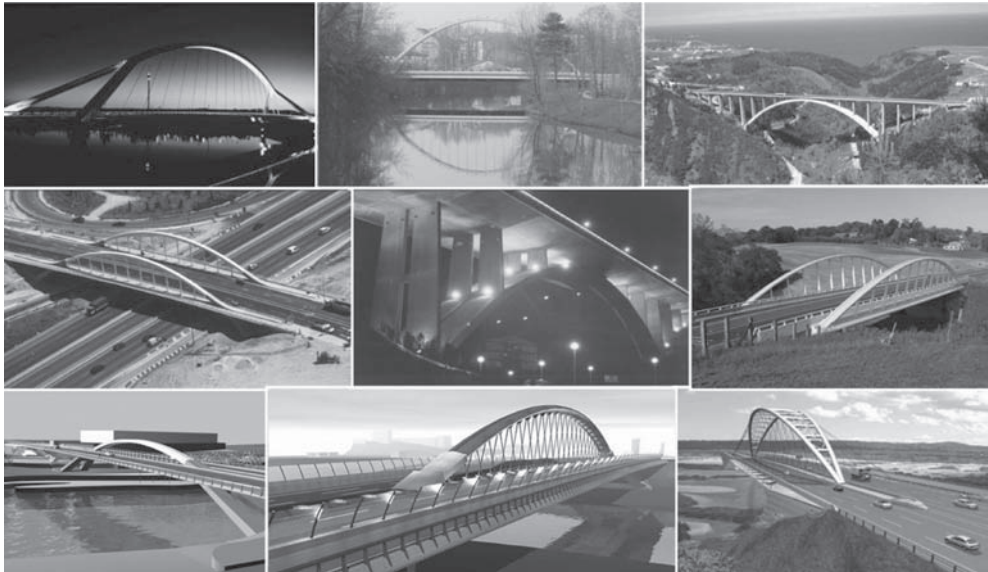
From top to bottom and left to right: Barqueta Bridge (Sevilla, Spain), Oblatas Bridge (Pamplona, Spain), La Regenta Bridge (Asturias, Spain), Barrial Bridge (Madrid, Spain), Morlans Bridge (San Sebastián, Spain), Hoznayo-Villaverde Bridges (Cantabria, Spain), 5th Logroño Bridge (La Rioja, Spain), Congressi Bridge (Roma, Italy) and Coega Bridge (Port Elizabeth, South Africa).
